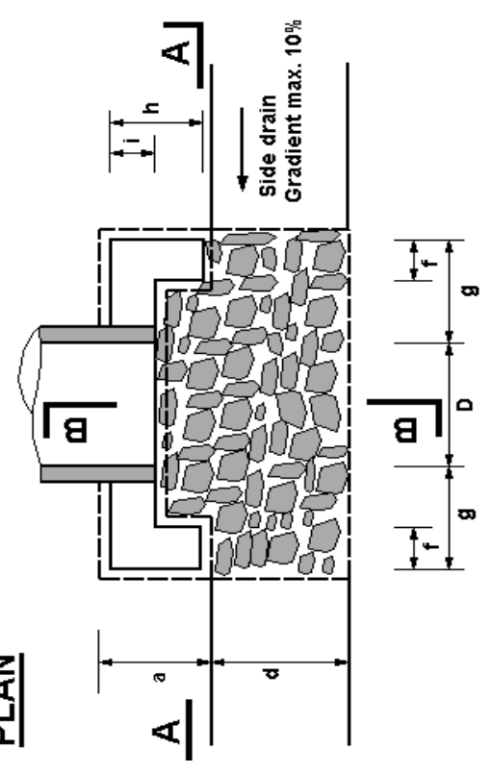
HEADWALL TYPE 3B (STONE MASONRY HEADWALLS)
